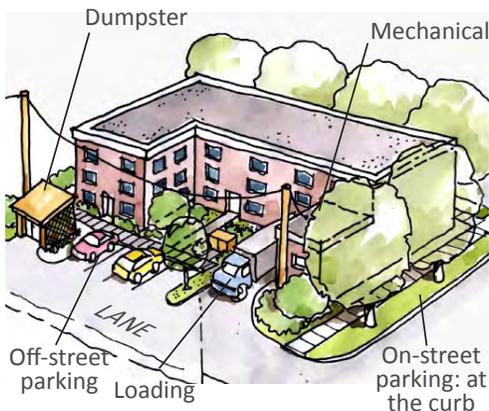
Parking, servicing and access should be provided in the rear of the building wherever possible to allow the building to present a friendly face to the street.
